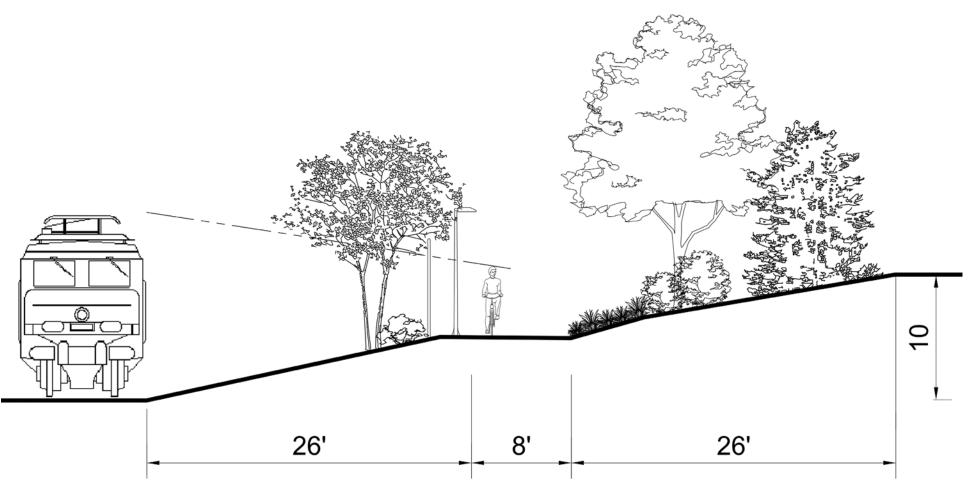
A section of the proposed rail trail shows how the trail can be separated from the train tracks with a vegetation buffer, fence and change in elevation.
